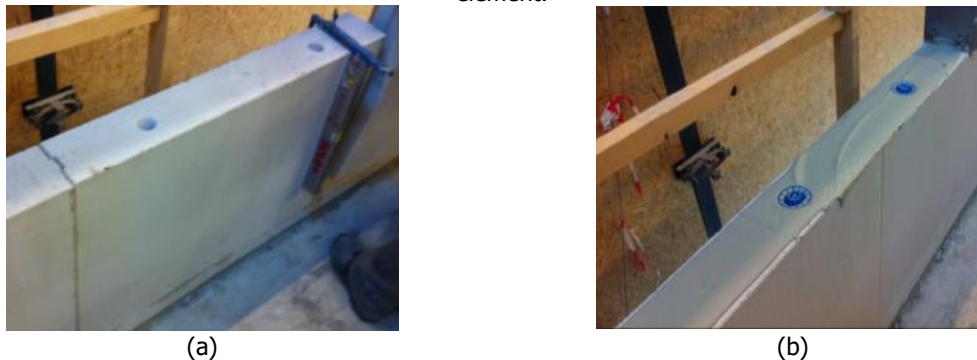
Calcium silicate element: (a) holes are present on the top side; (b) plastic tools used to fill the holes.
